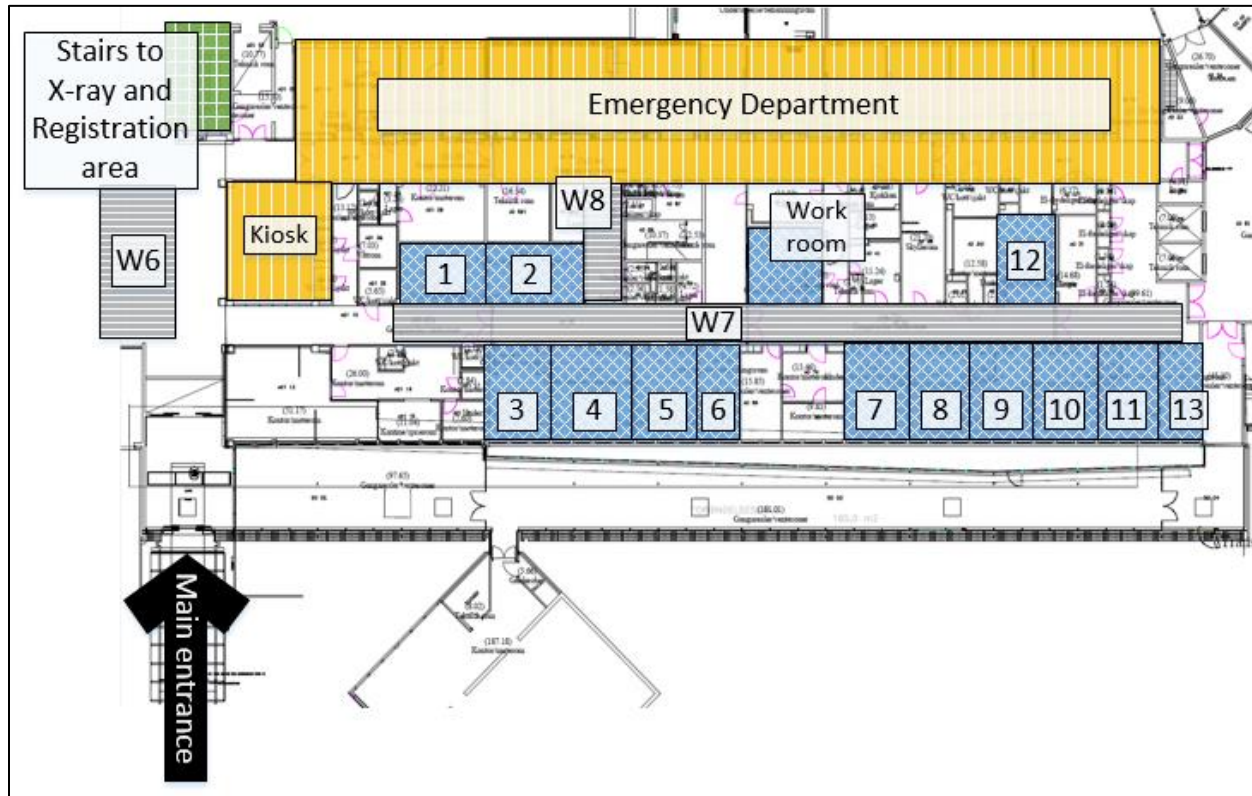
Floor plan over Outpatient Department 2 and surrounding areas.
